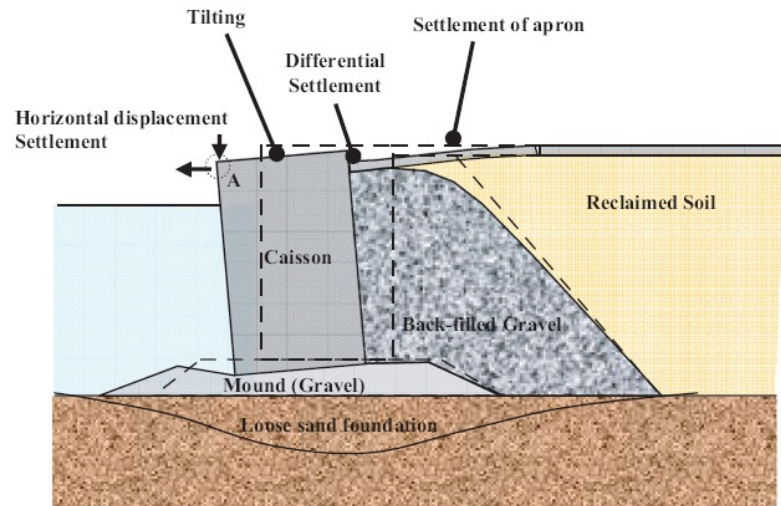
Typical section of damage criteria for a quay wall (From (Na et al. 2008))
